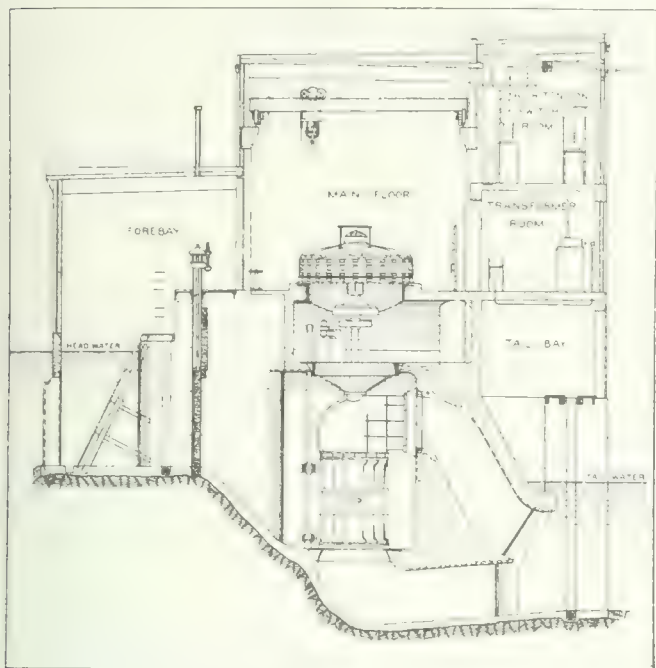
Cross-section of Power-house at Wasdell's Falls.
